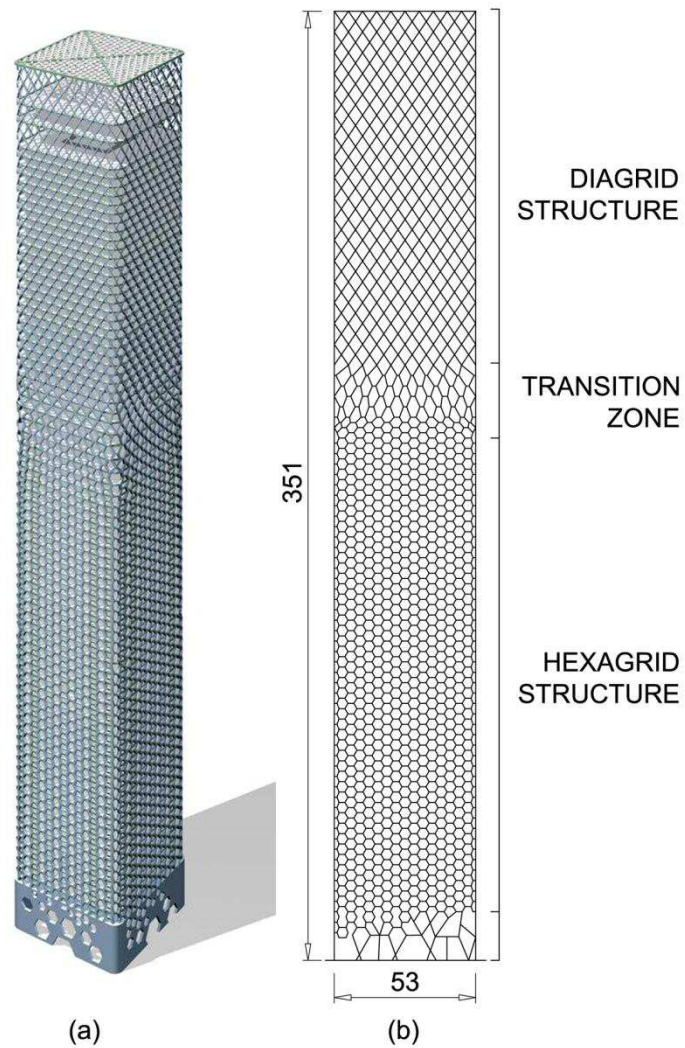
Sinosteel Building structural configuration a) 3D view; b) façade (from www.i-mad.com)
